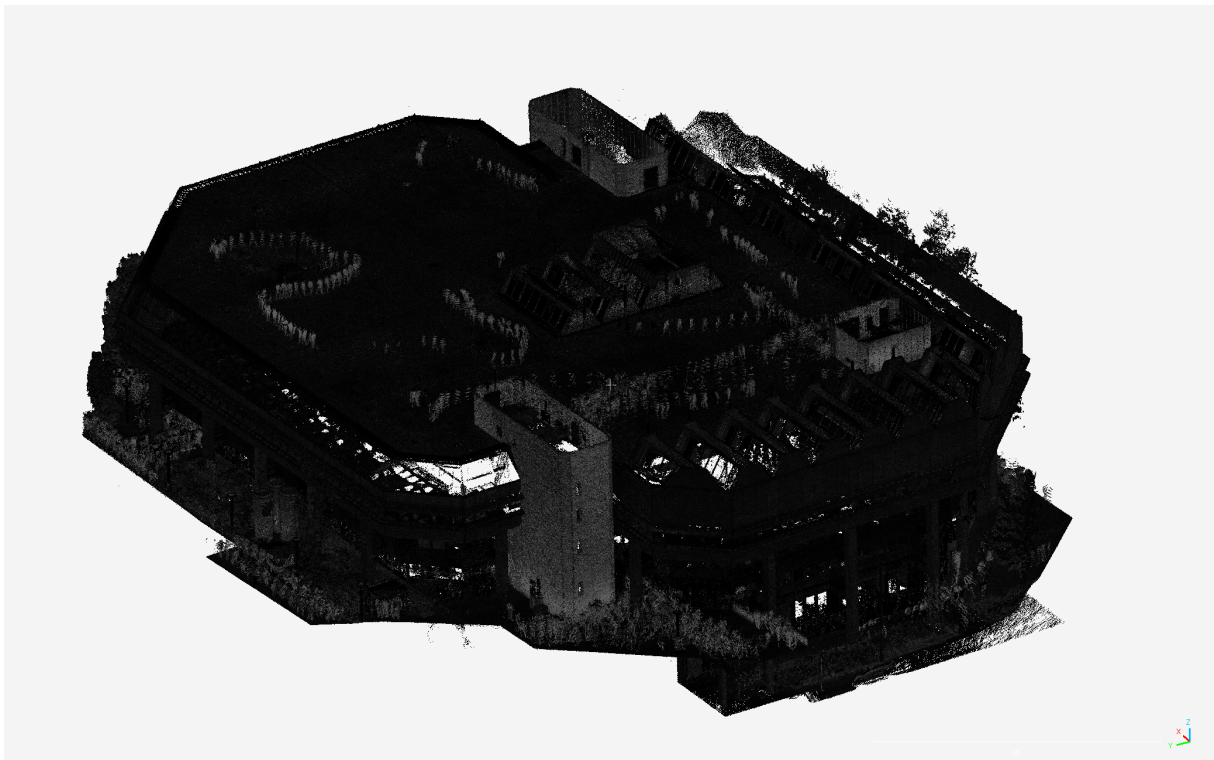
The Final Point Cloud with Merged Facades and Roof Sections (own illustration)
